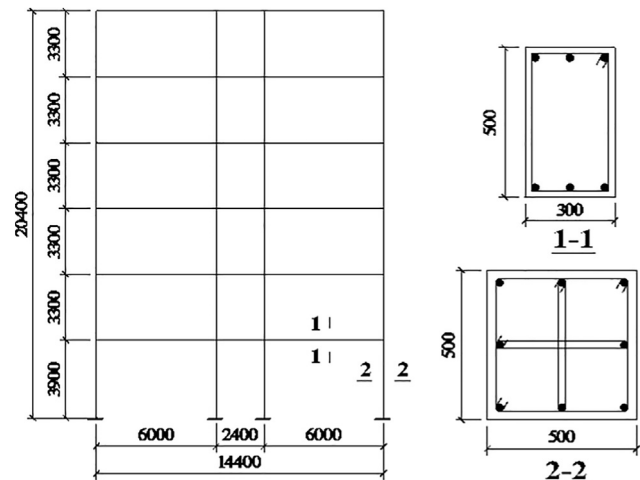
Elevation of the frame and reinforcement details for beams and columns.
